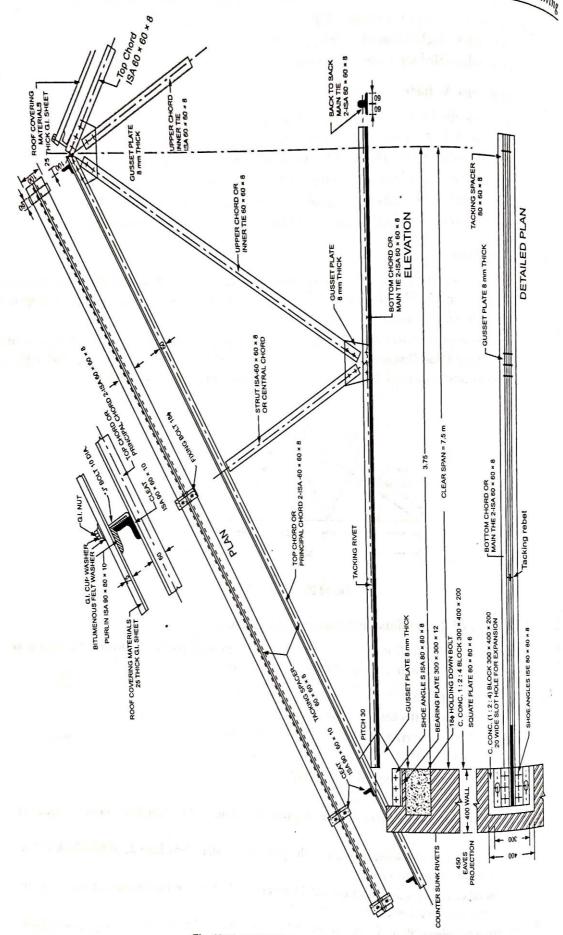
A SIMPLE FINK STEEL ROOF TRUSS
